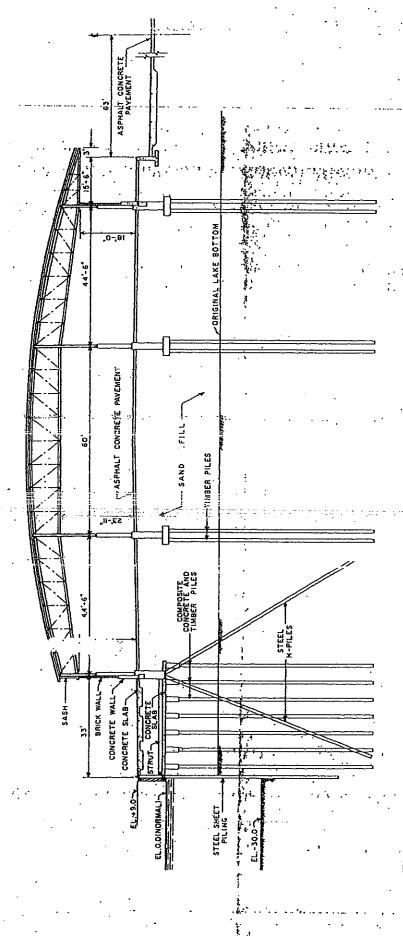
Typical cross section, South Pier No. 2, Milwauker, Wisconsin; (Courtesy The American Association of Port Authorities,
